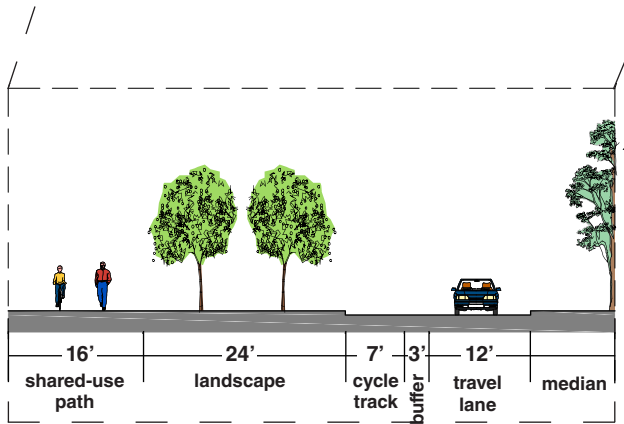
Two-Sided Trail Parkway Street Section - Option 1: Two Lane Road with Cycle Track
